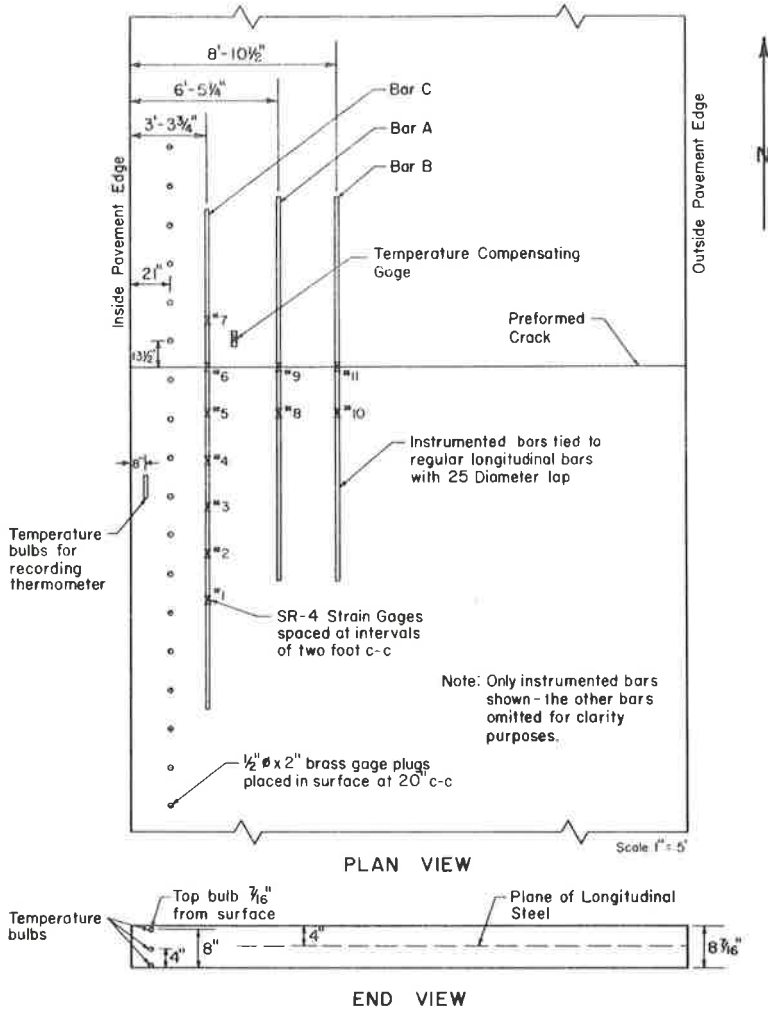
Detailed layout of instrumentation for pavement with 0.5 percent longitudinal steel (NBL), Walker Co.
